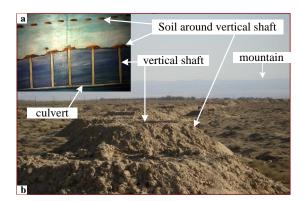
Karez structure in Turpan Basin (Figure a is underground structure and b is ground surface structure)
